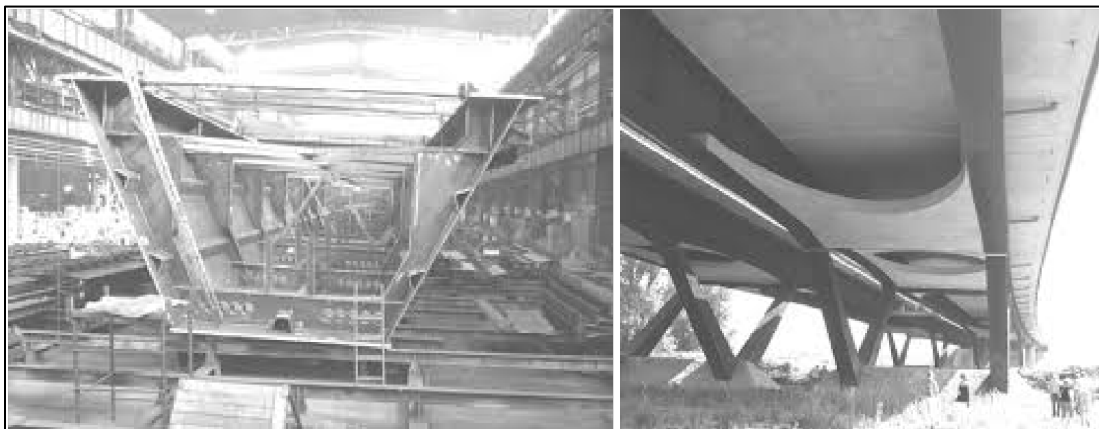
Example of hybrid box girder bridge (PAŃTAK 2012)
